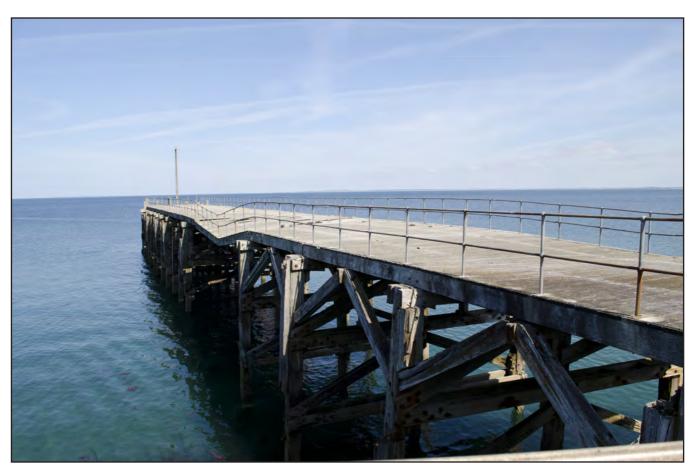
Detail of timber pier showing collapsed section (archive image: G2475_Trefor_Pier_006)
